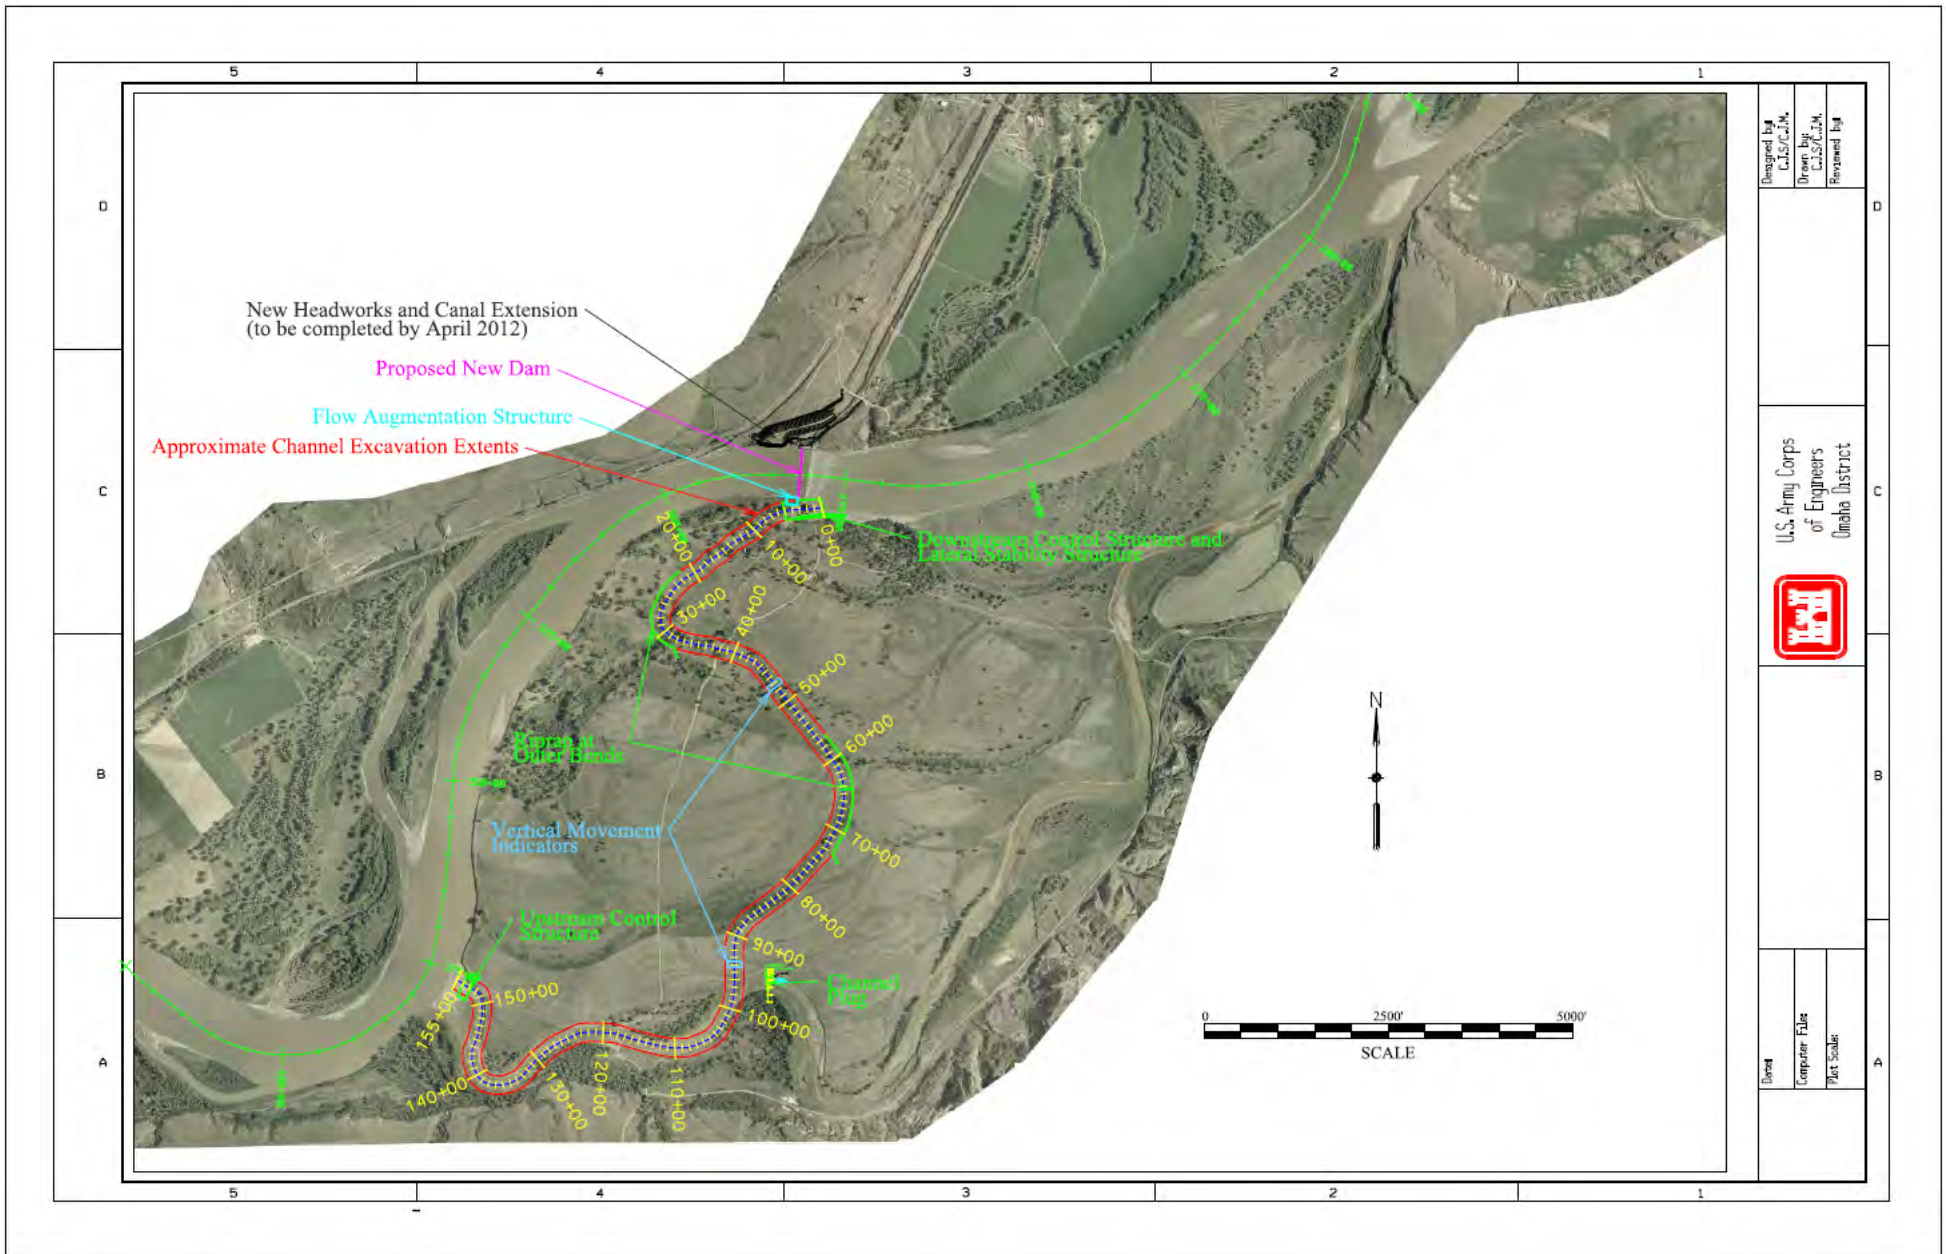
Map of preferred Intake Dam bypass plan as of Jan. 5, 2012 showing structural components.
